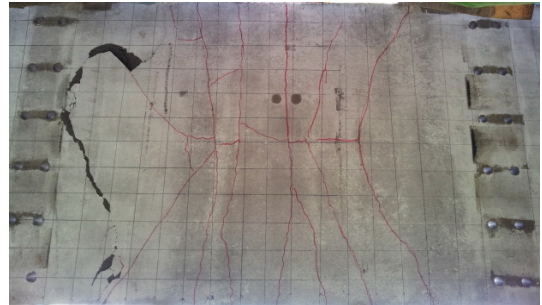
Crack patterns of lateral and bottom surfaces after failure
